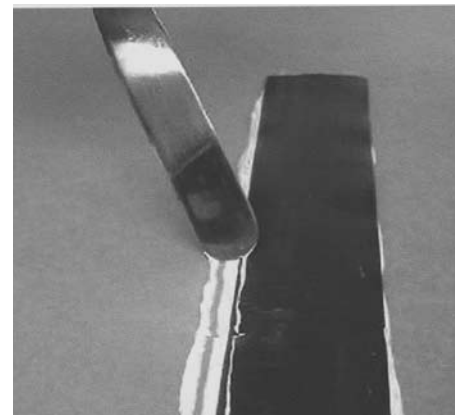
Tool excess silicone from squeeze-out and if masking tape was used remove immediately. (Masking tape must be removed before silicone skins over, usually within 20 minutes of dispensing.)
